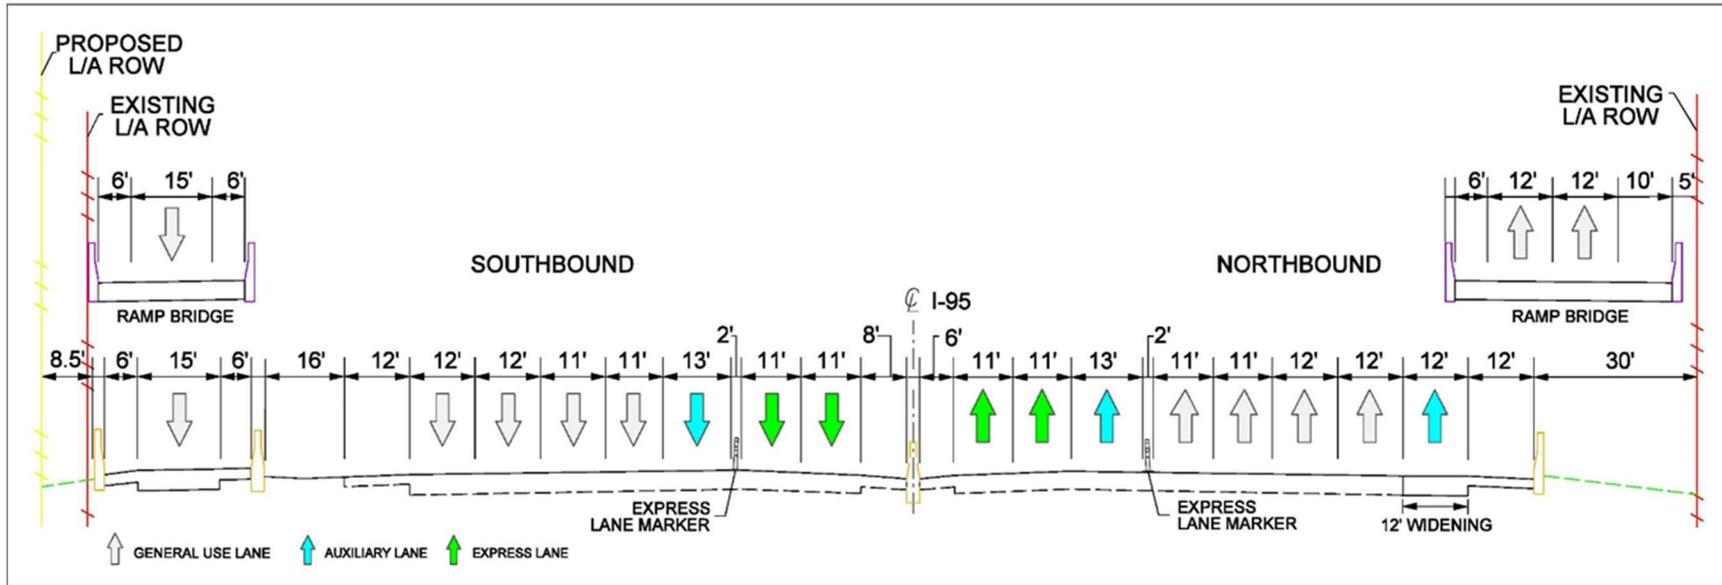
Alternative 2 North of Hallandale Beach Boulevard
